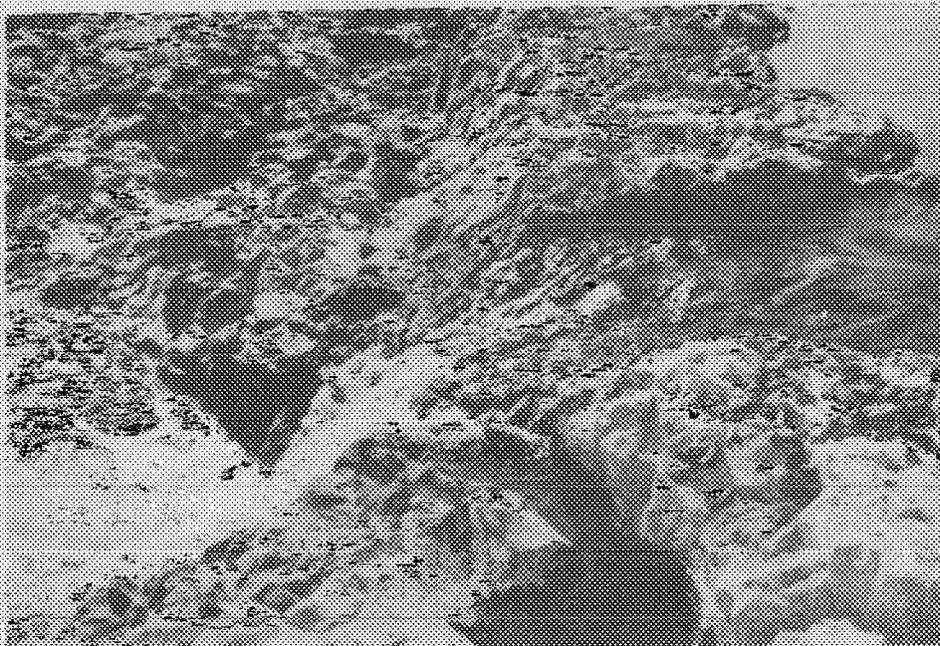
ROCK REMOVAL AS CONSTRUCTED
